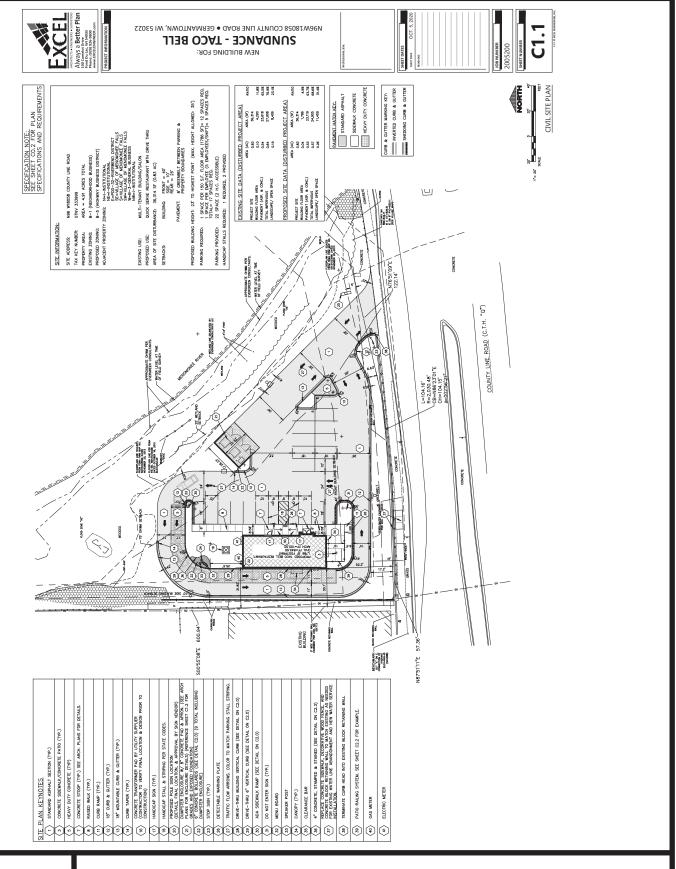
CONCEPTUAL SITE PLAN
